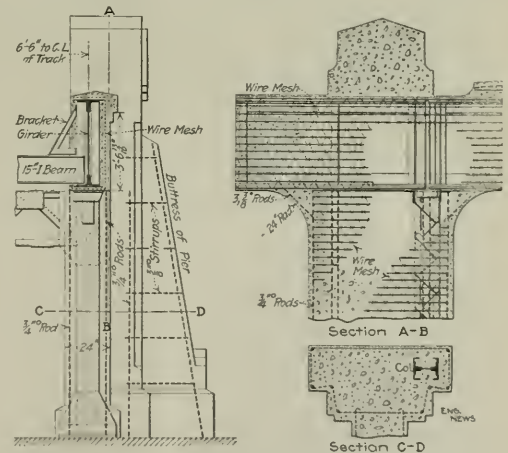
CONCRETE CASING FOR GIRDERS AND COLUMNS OF THE 32-FT. ROADWAY SPANS OF THE VIADUCT OVER INDEPENDENCE BOULEVARD, CHICAGO
